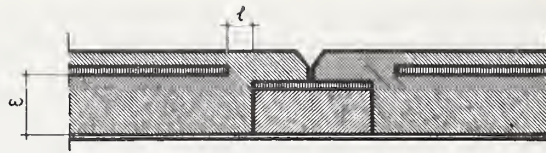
Concrete wall incorporating light insulation joint between two panels.
